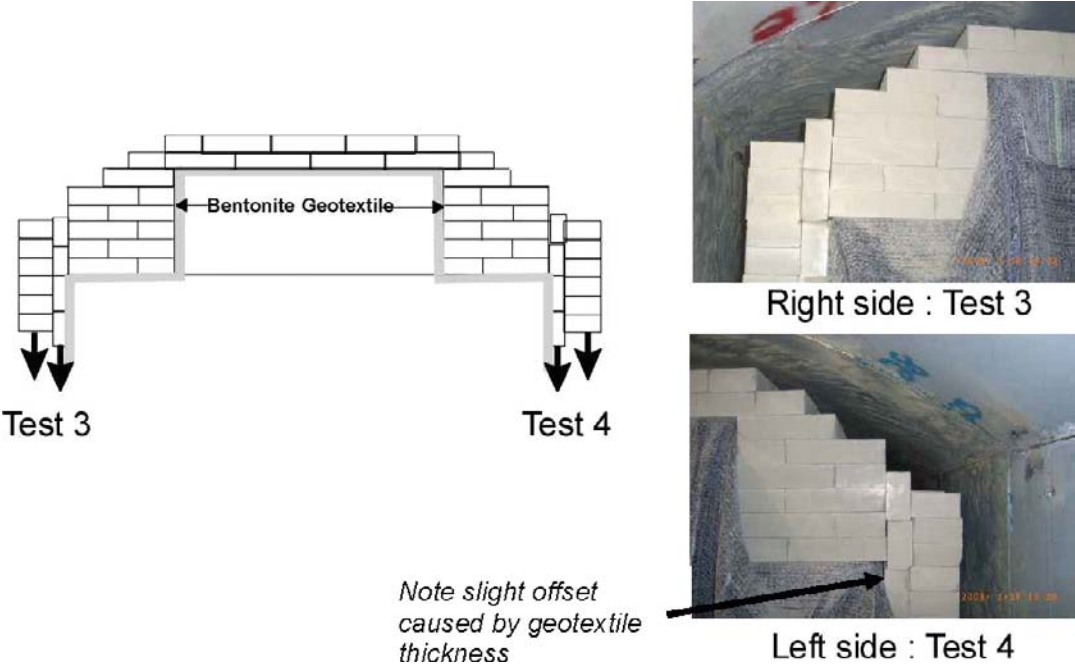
Details of block layout in crown of Assembly 2 (Tests 3, 4).
